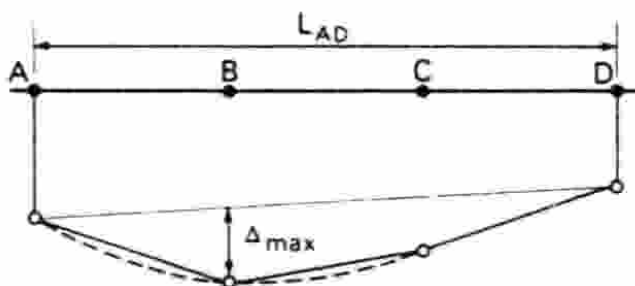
Simplified scheme and nomenclature for each building façade/masonry wall element
